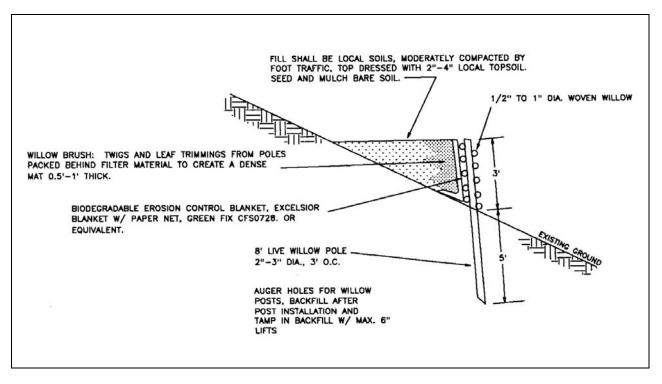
Willow Wall Revetment (L. Prunuske, 1997).
